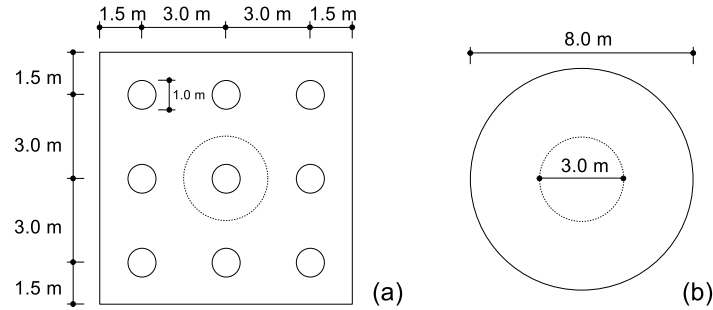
Plan view of the foundations: (a) pile group foundation and (b) circular shaft foundation.
